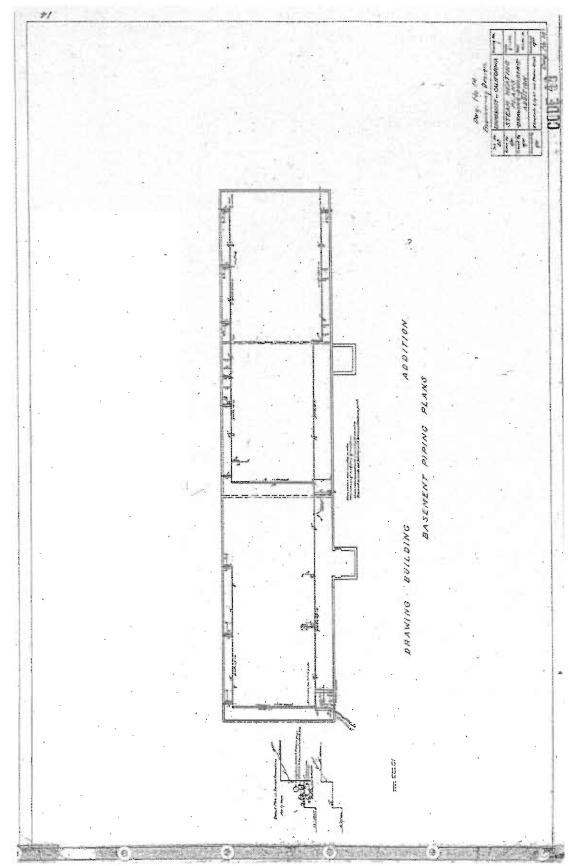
Drawing Building, Steam Heating Plan - Foundation Plan (Capital Projects, Plan Room, UC Berkeley)
